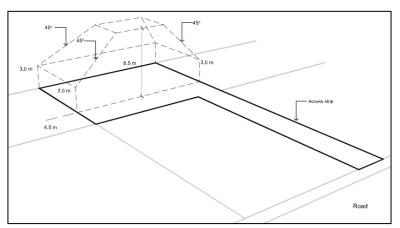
Building envelope for internal lots as required by clause 8.4.2 A3(a)
